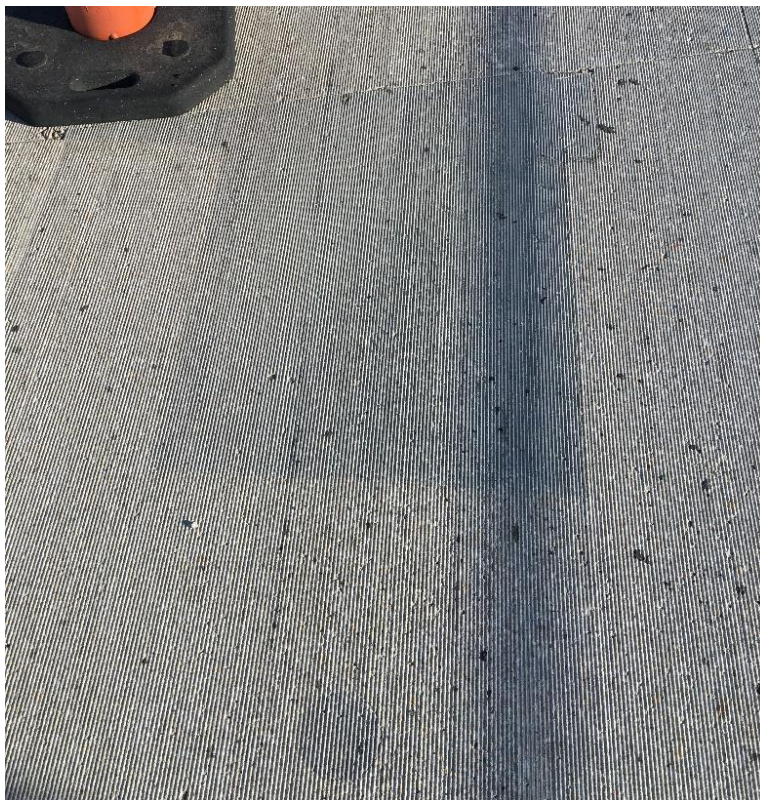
Anchorage block and grouting hole in the precast concrete deck
